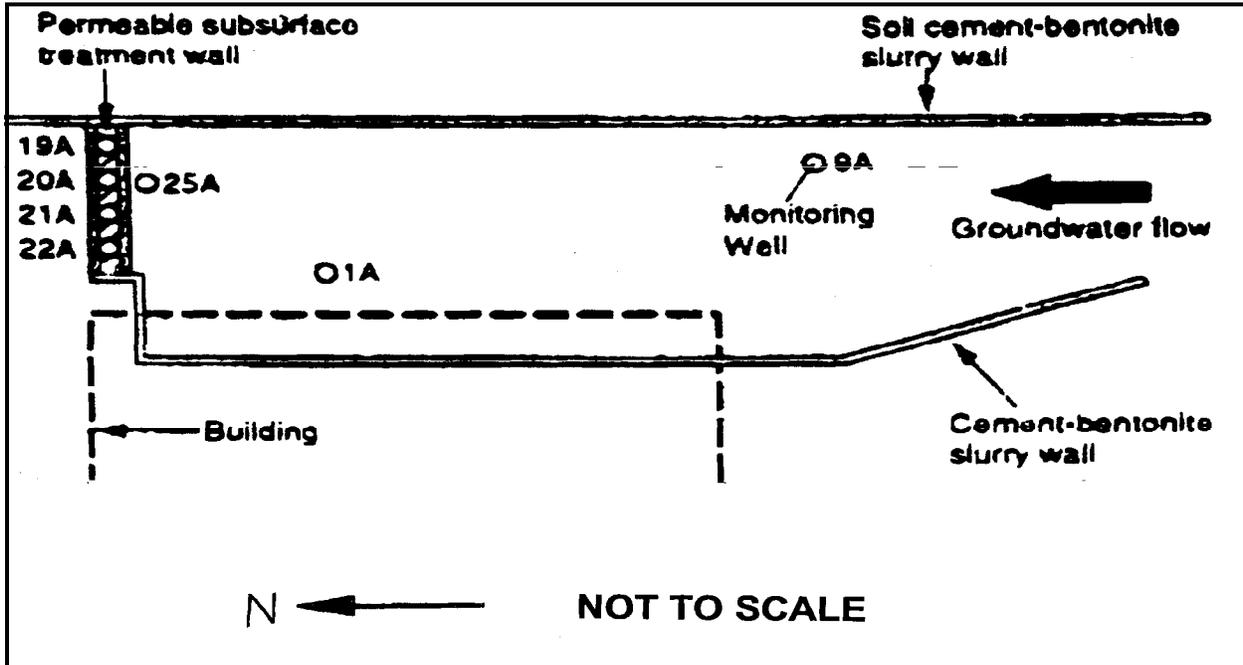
Plan View of the Treatment and Slurry Wall System (Best Copy Available) [16]
